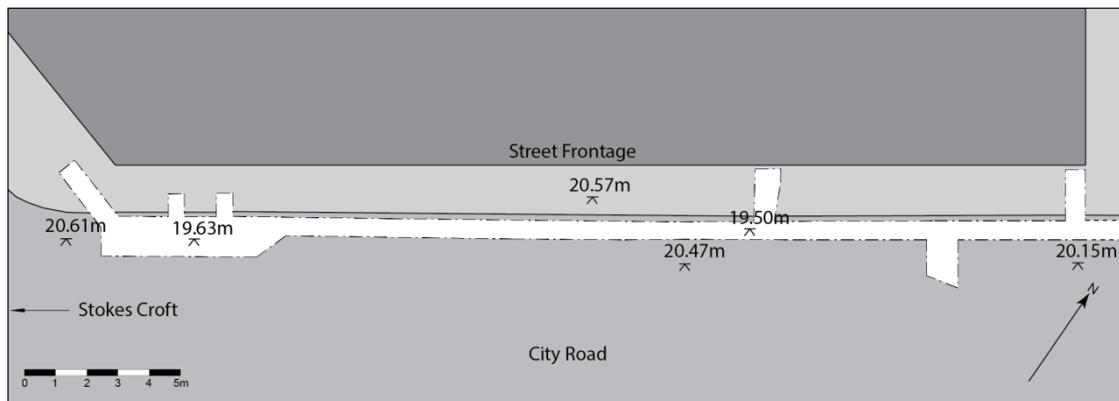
Plan of ground works at the junction between City Road and Stokes Croft
